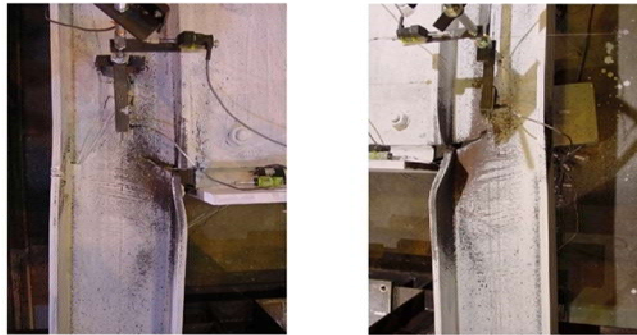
Beam-to-column connection failure (Uriz, 2005)
